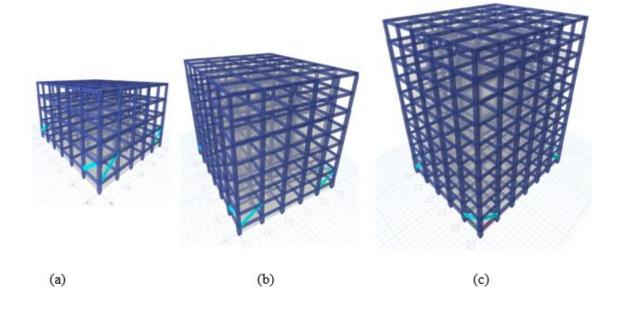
3D view of infilled (a) 4, (b) 7, and (c) 10 storey buildings
